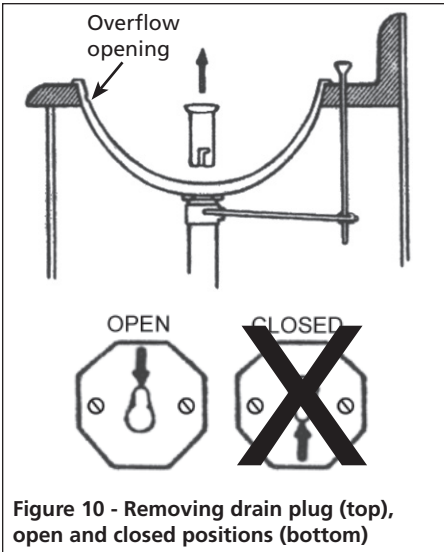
Removing drain plug (top), open and closed positions (bottom)
